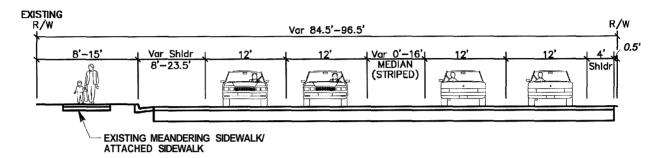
Segment 2 – Interim Roadway Section – Legacy Estates to South Mills Avenue (Lookiizg East)
